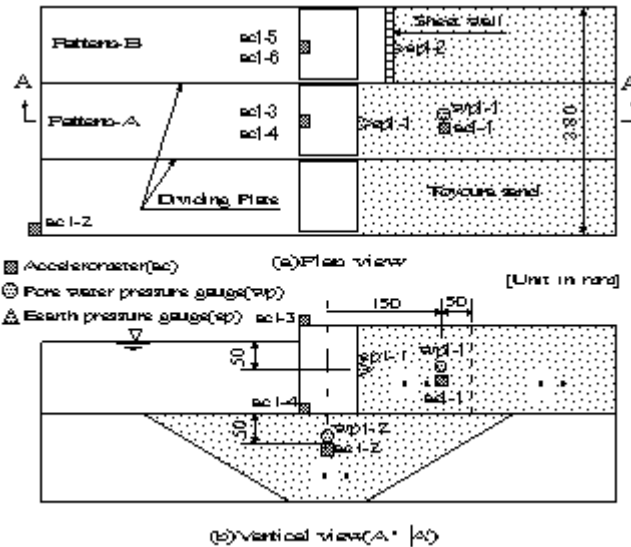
The plan and vertical view of gravity-caisson type quaywall model
